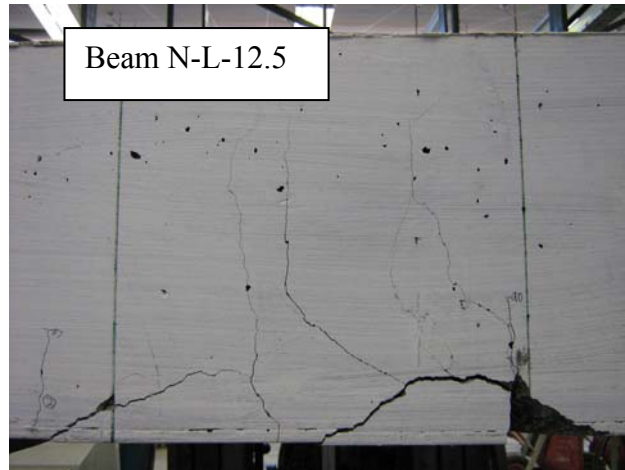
Crack Pattern of Normal Strength Geopolymer Concrete Beams over the Splice Region After Failure (L-Series)
